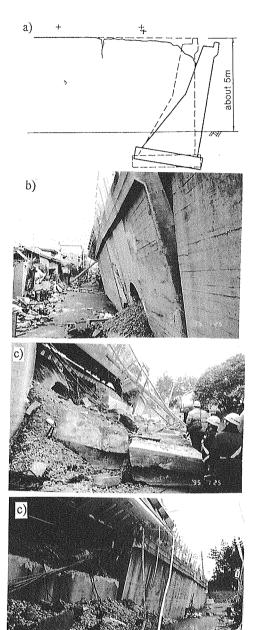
Typical damage to gravity-type unreinforced concrete RWs; embankment for Main Line of Hanshin Railway Co. adjacent to Ishiyagawa Station (Site GT1 in Fig. 2); a) sketch, b) picture and c) pictures
